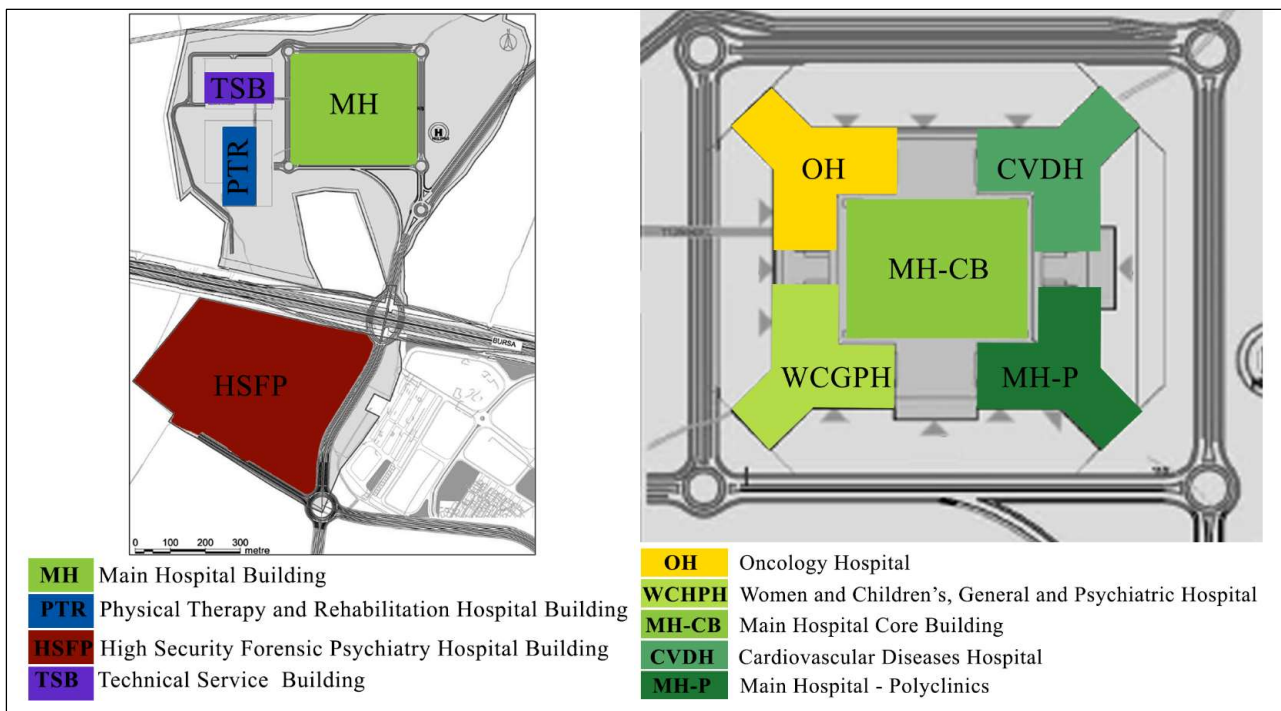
A typical integrated healthcare campus, Site plan (left), main hospital buildings (right)
